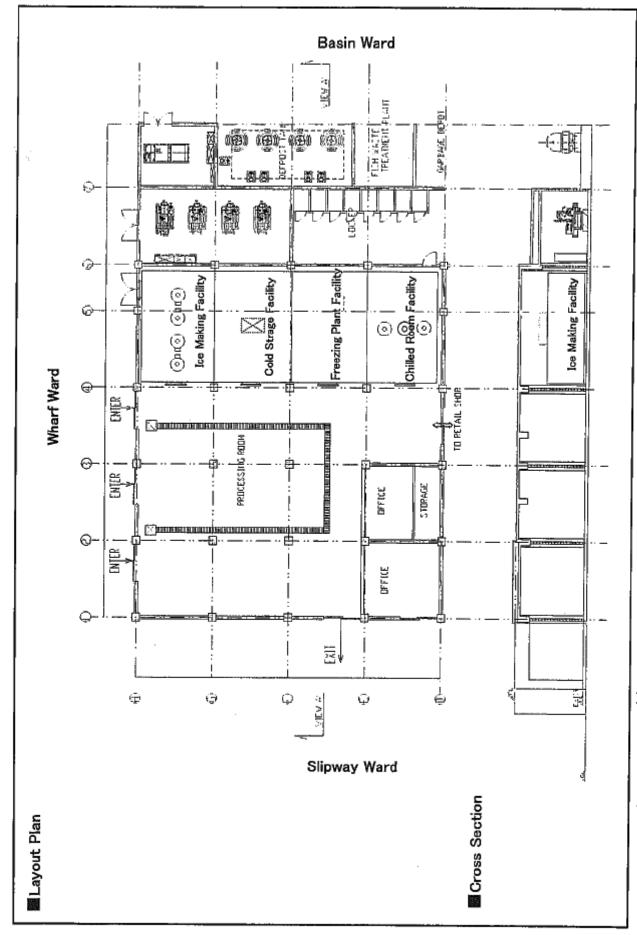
(3) Existing Plan and Cross Section of Fisheries Center, Ground Floor
